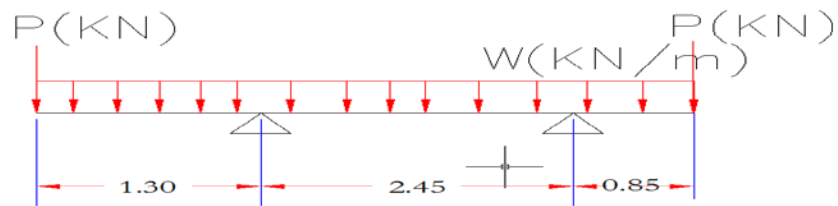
2 Dead loads applied for 1m strip of 20m span single cell box girder railway bridge deck
